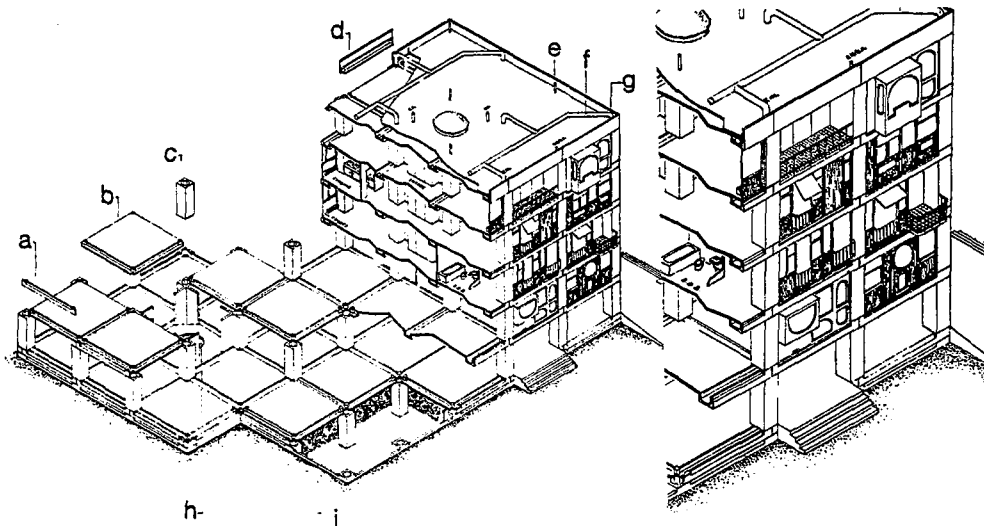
Axonometric drawing of the Les Marelles building system: a,b,c,d, pre-cast beam floor slab, hollow column, parapet wall; h is a special slab to accept a prefabricated staircase; e,f,g are elements of the mechanical system which is housed in the edge-beams and columns, i is a conventional foundation. Conceptually, facades are to be designed by inhabitants (this part is zoomed on the right side).
